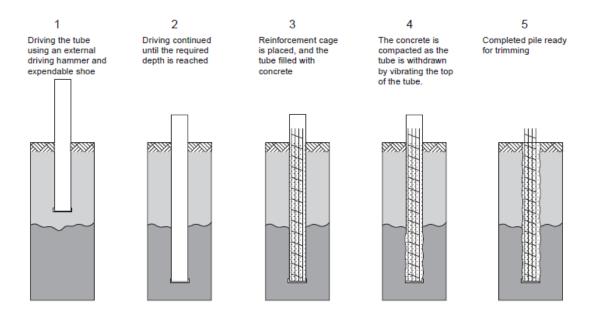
Installation sequence of cast in place concrete pile [4]
